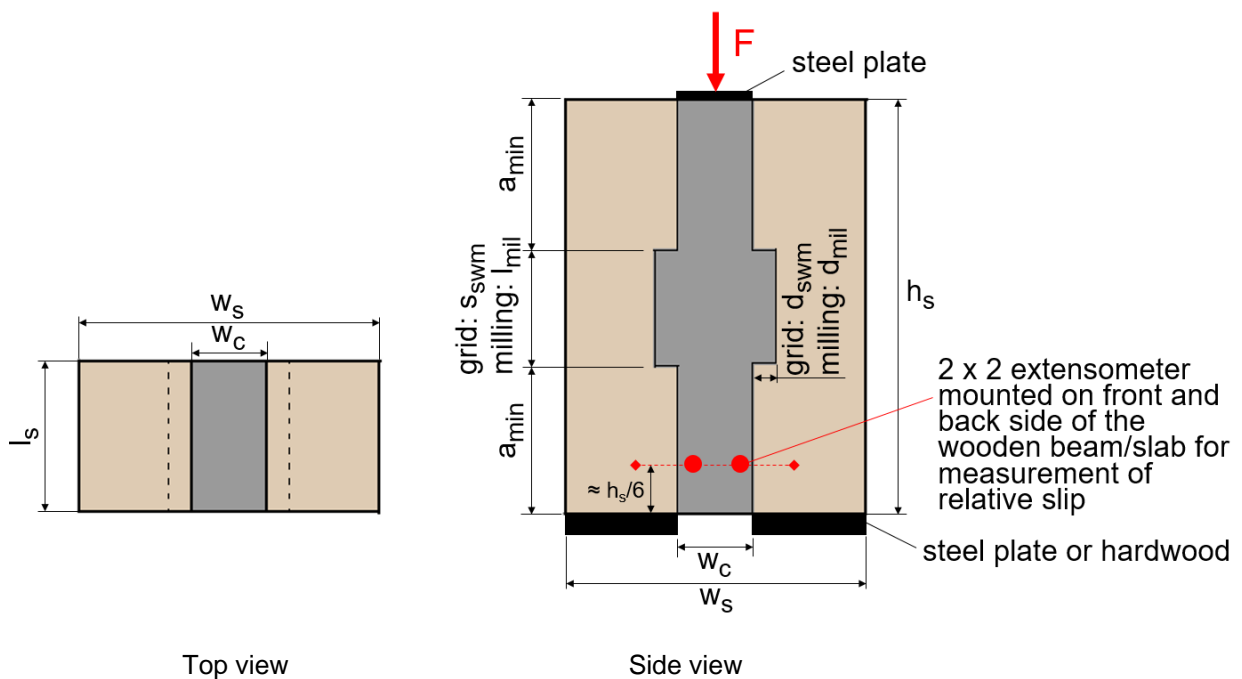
Exemplary configuration for compression shear test in structures with wooden beams or slabs as base material and solid wood members (single boards) as shear resistant connections (symmetric arrangement)
